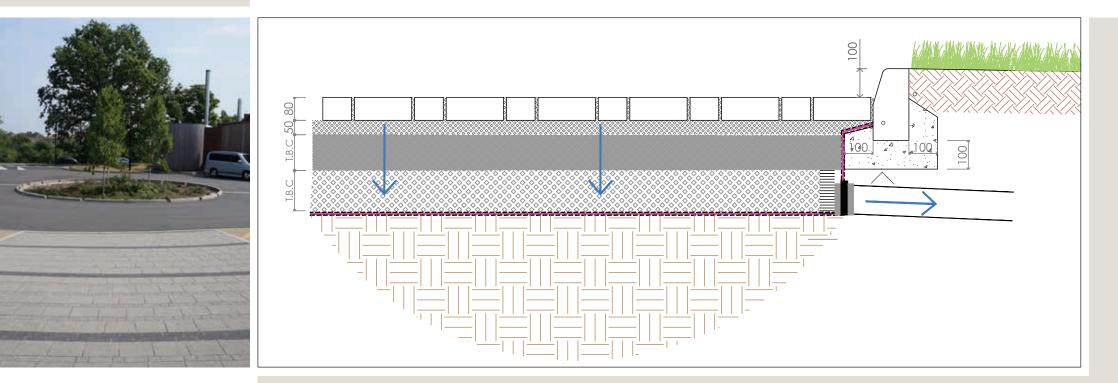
DETAILING PERMEABLE PAVING & SUDS WITH PRECAST CONCRETE PRODUCTS
